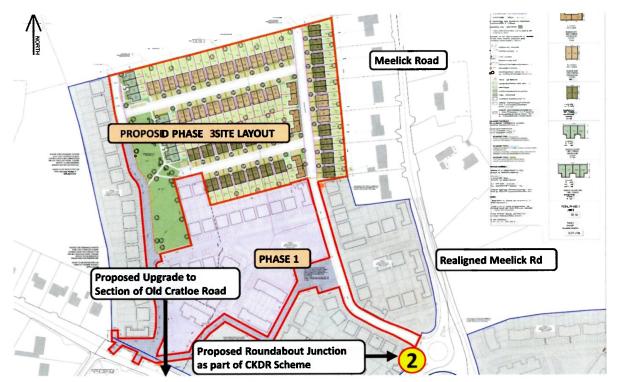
Proposed Road Layout (extract from site layout drawing & labelled for ease of understanding)
